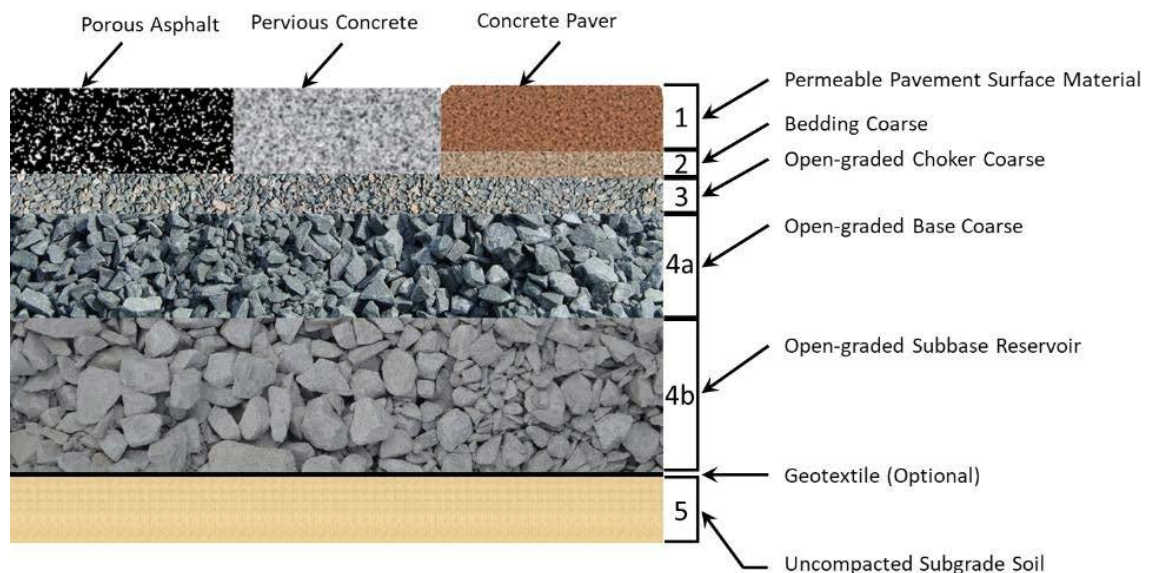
Example of a Permeable Hardscape Cross-section – Source: Eban Bean, University of Florida IFAS Extension
